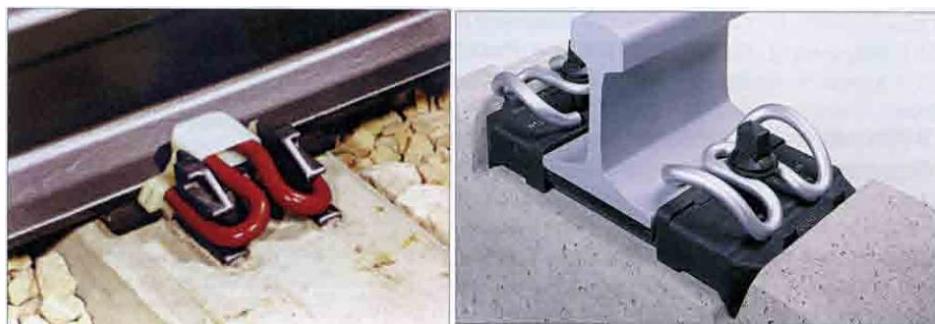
Elastic rail fasteners for reinforced concrete sleepers: the anchor bond “Pandrol” and the bond “Vossloh”.
